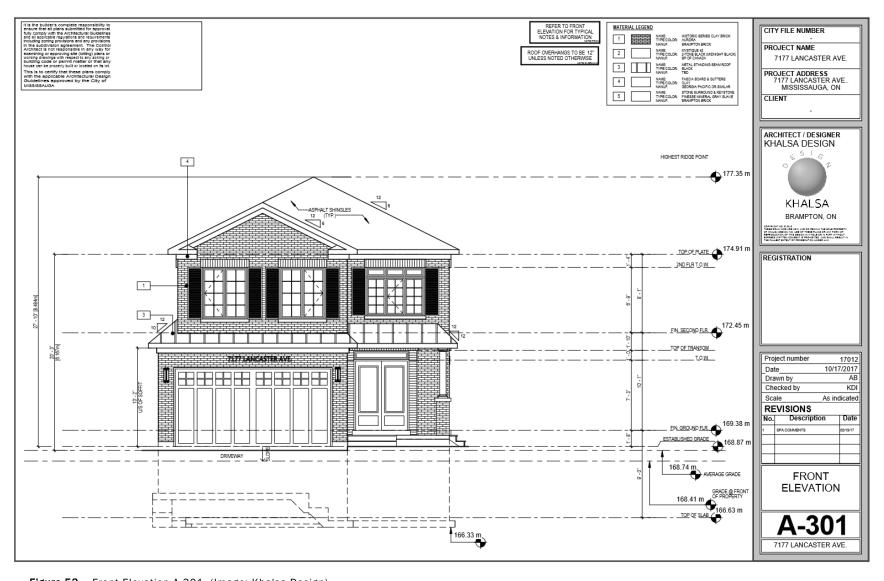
Front Elevation A-301. (Image: Khalsa Design)
